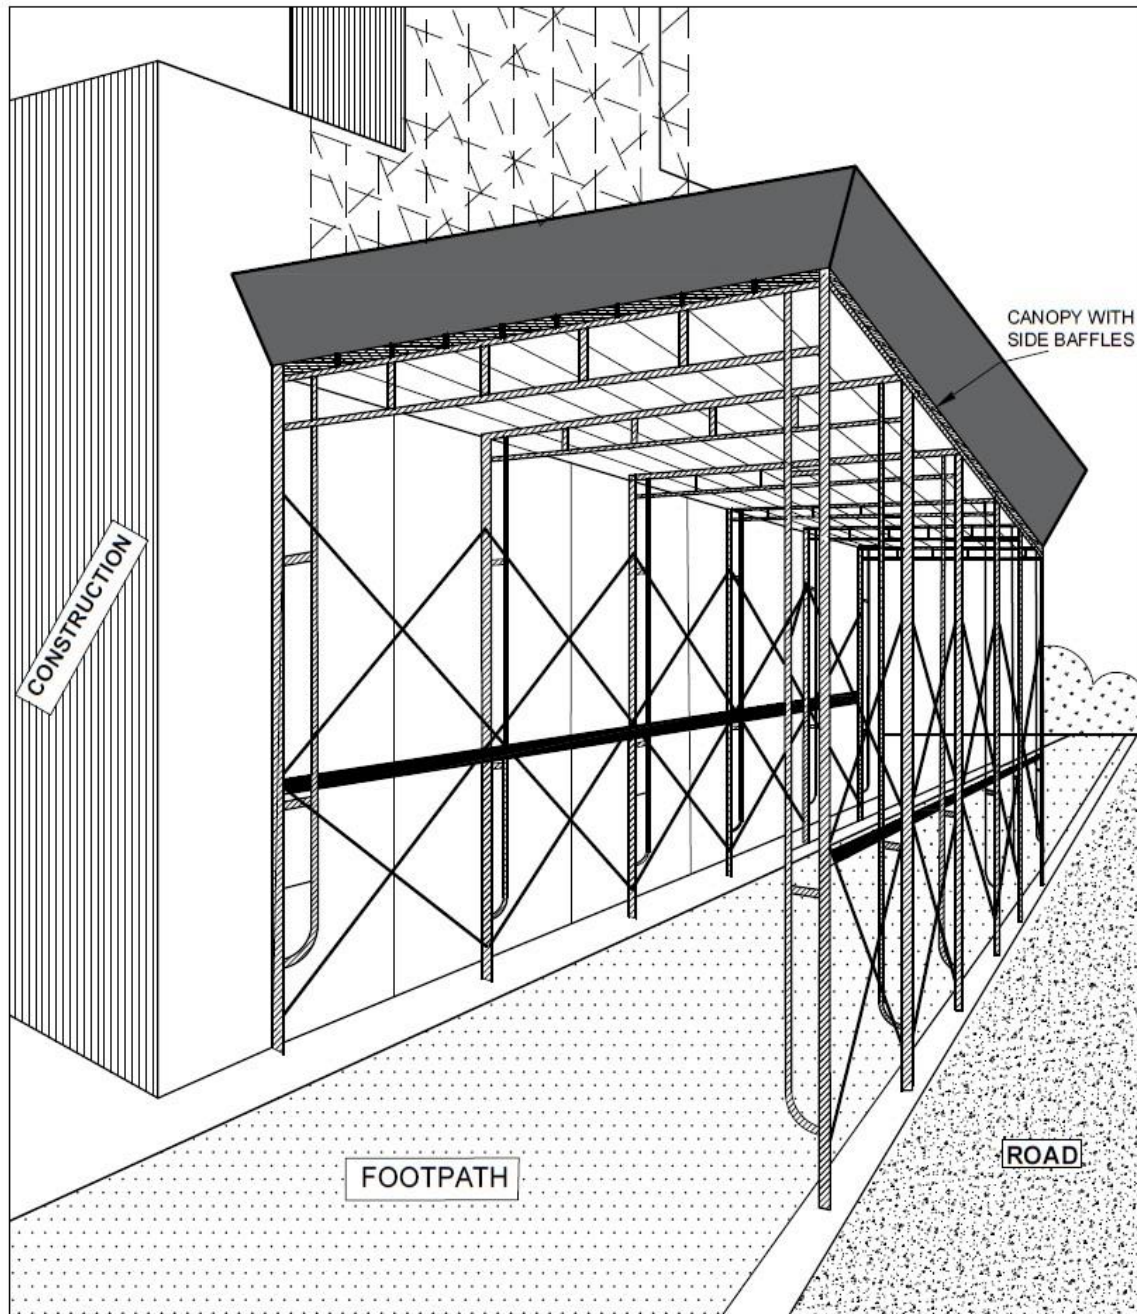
TYPICAL SKETCH OF A SIDE CANOPY
